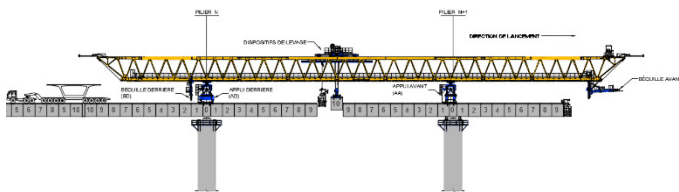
Side view of erection equipment used for typical viaducts / Vista del carro varo utilizzato per i viadotti tipici.
